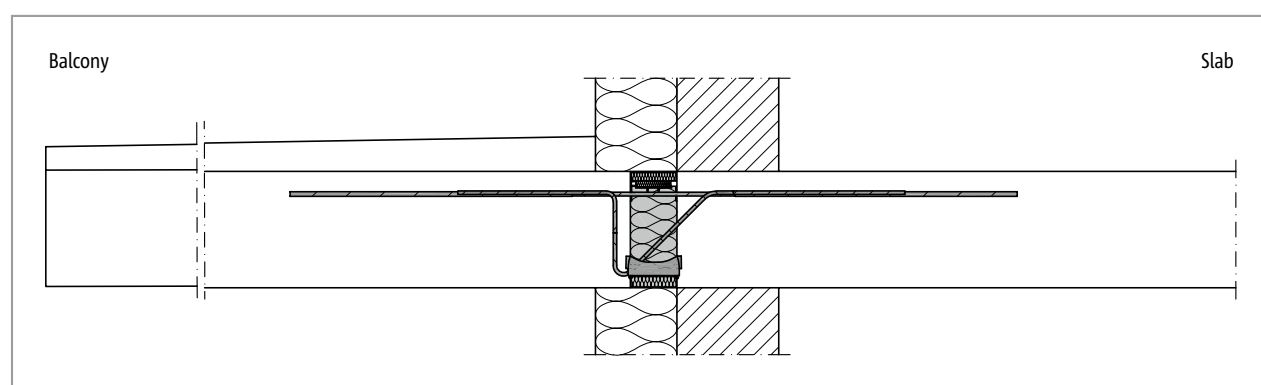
Schöck Isokorb® T type K...-REI120: Balcony connection REI 120
